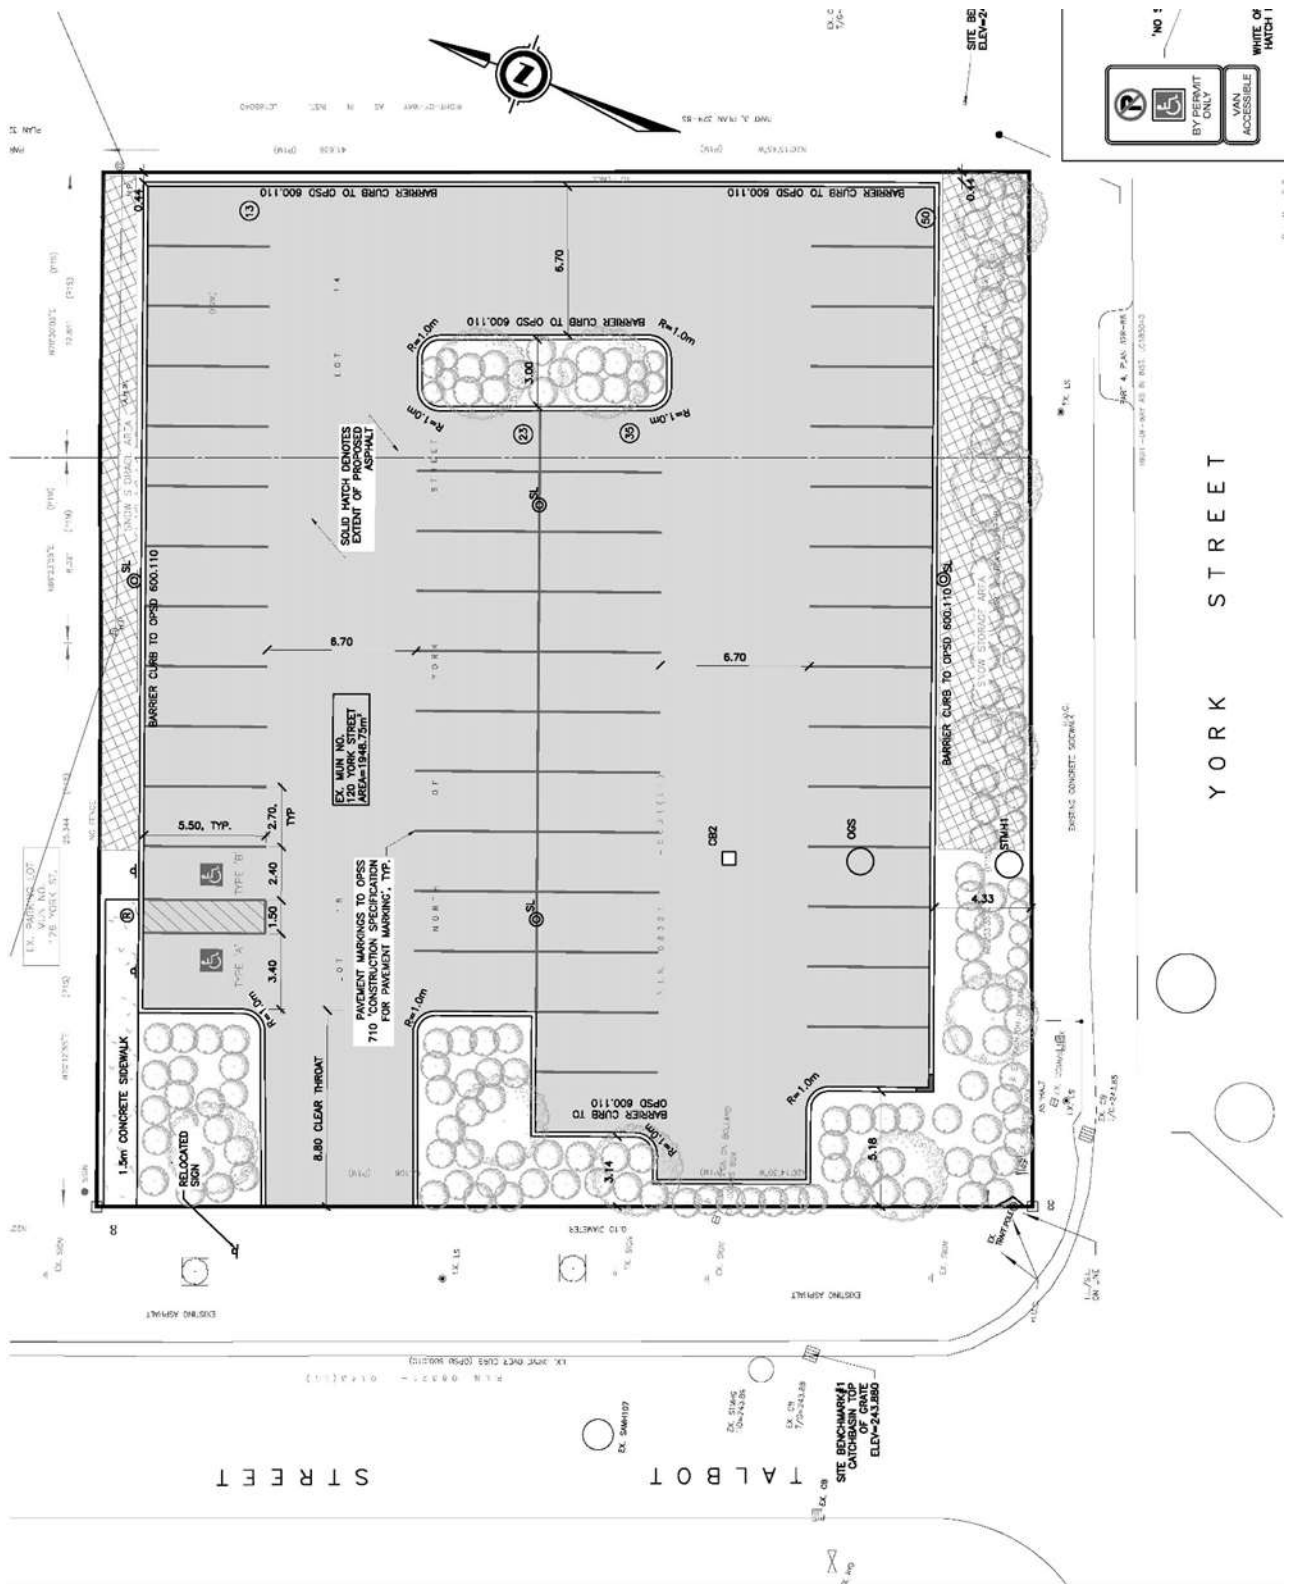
Site plan of proposal indicating parking layout and landscaping (stamped 2020-03-13).
